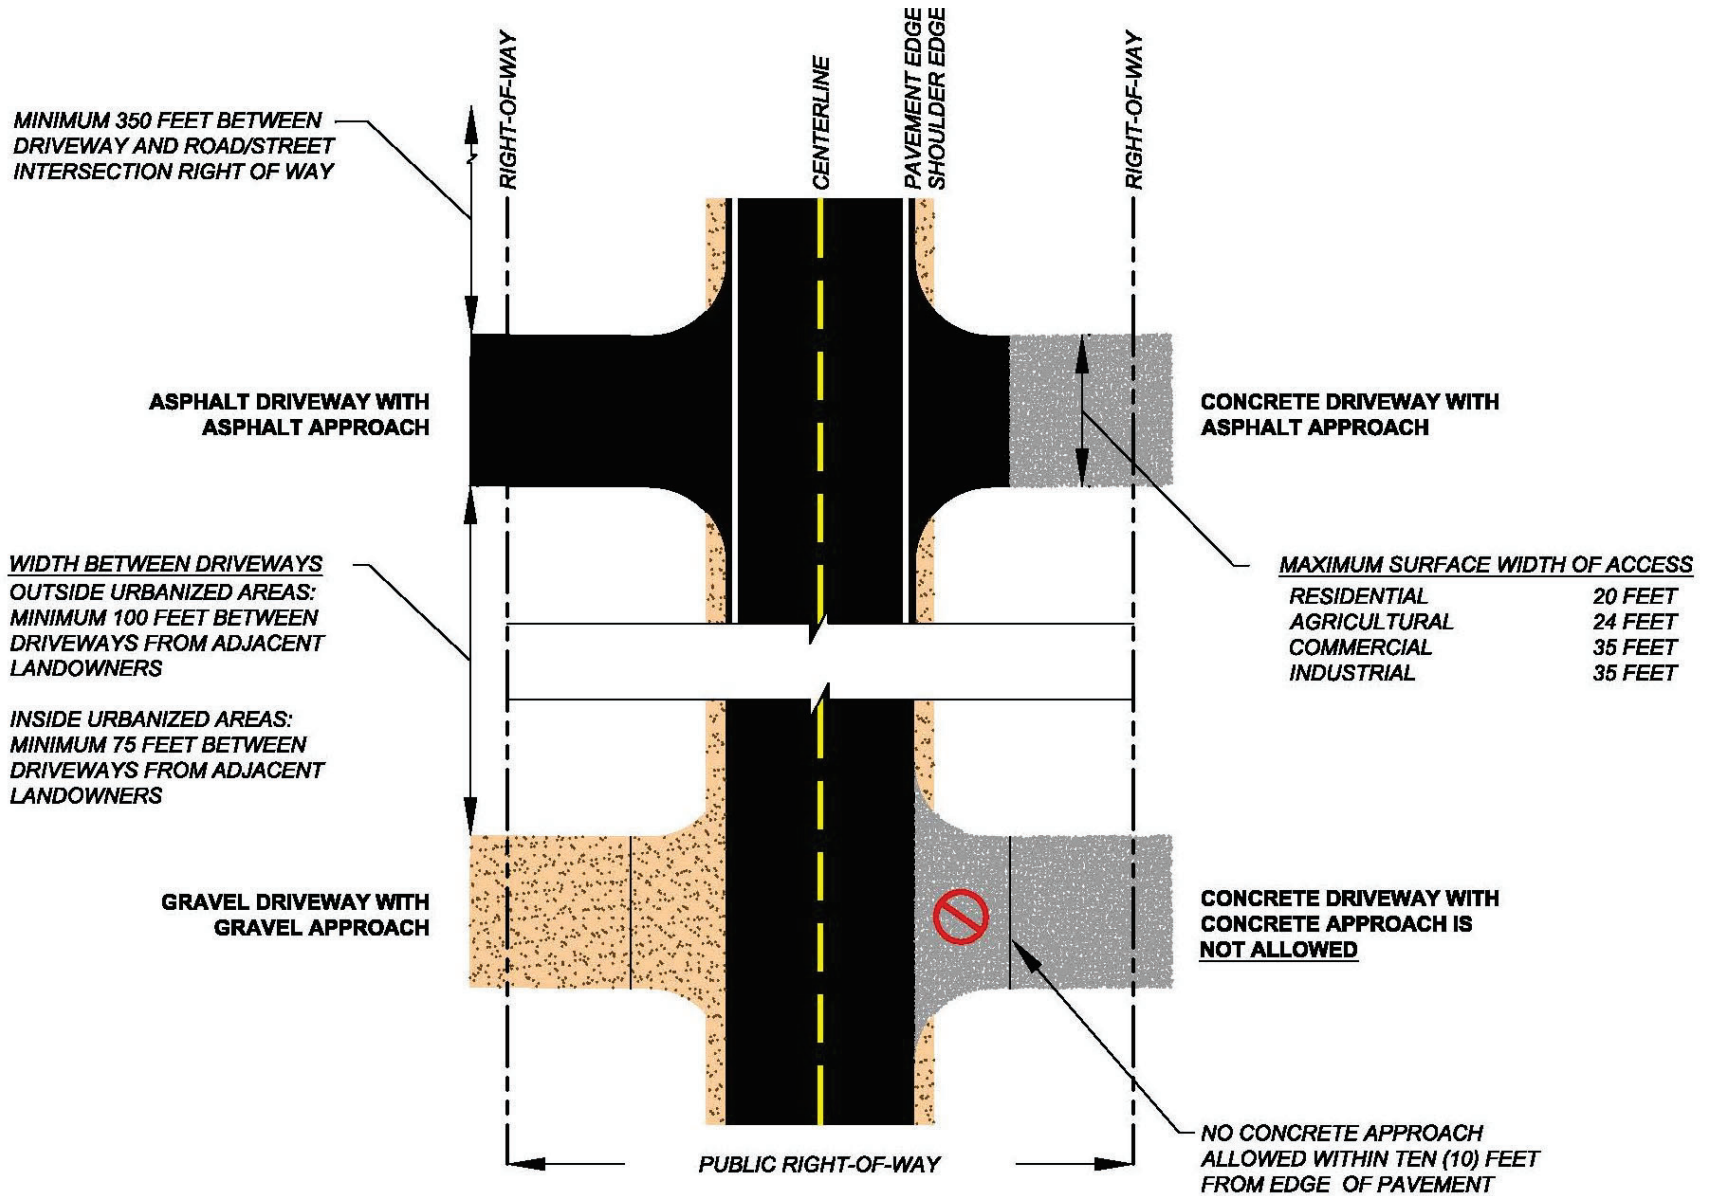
Typical Maintenance Limits for County Highway Intersections with Side Road and Driveways
